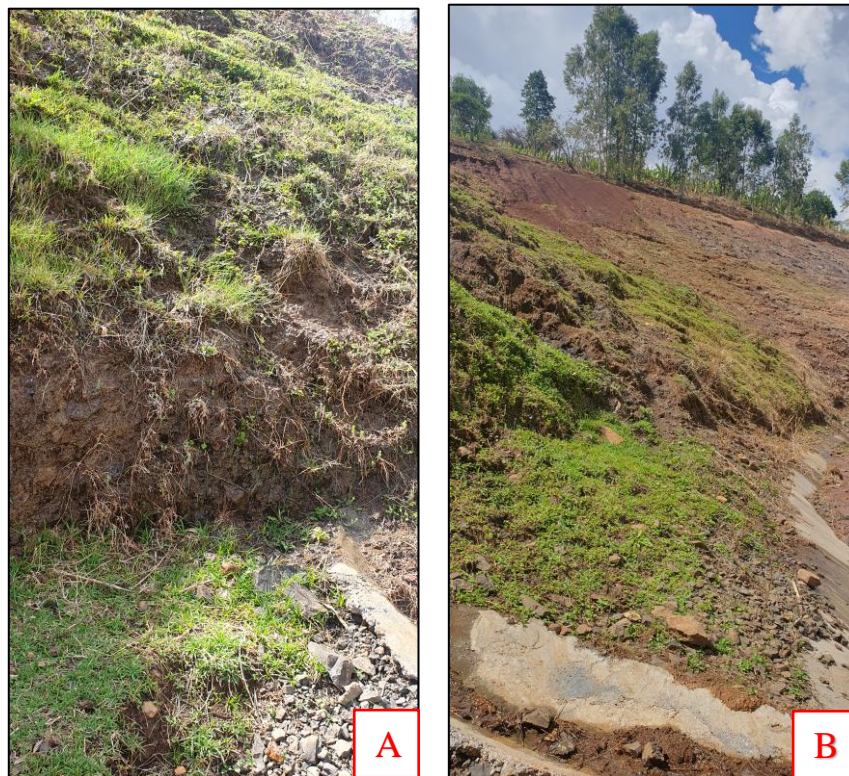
A) The road face cut exhibits the growth of hydrophilic vegetation B) Wet patches
